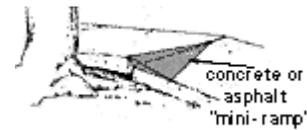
A "mini-ramp" can be used to smooth the uneven surface caused by root damage to pavement.
